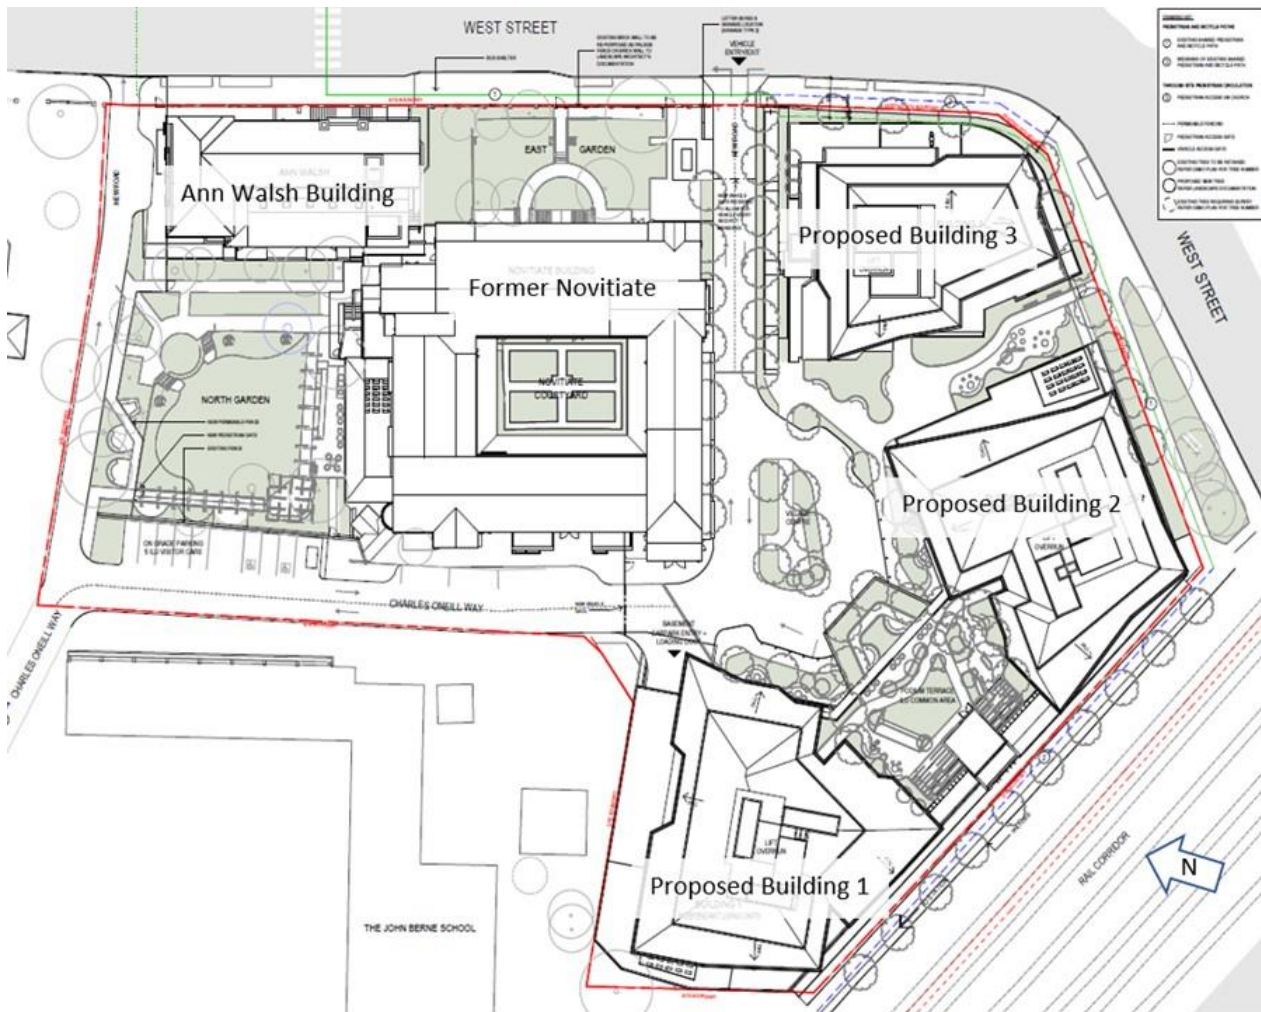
Site Plan (Source: Architectural Plans by Jackson Teece)
